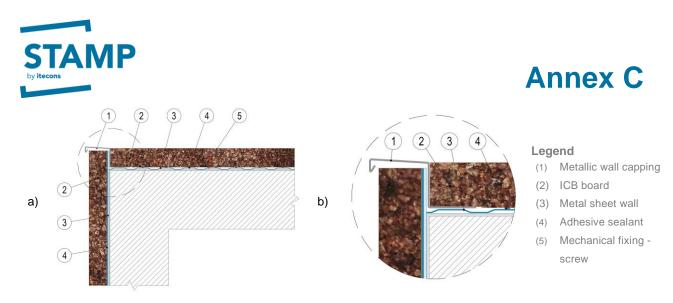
Connection facade/flat roof: a) General view; b) Detail of the wall capping application.
